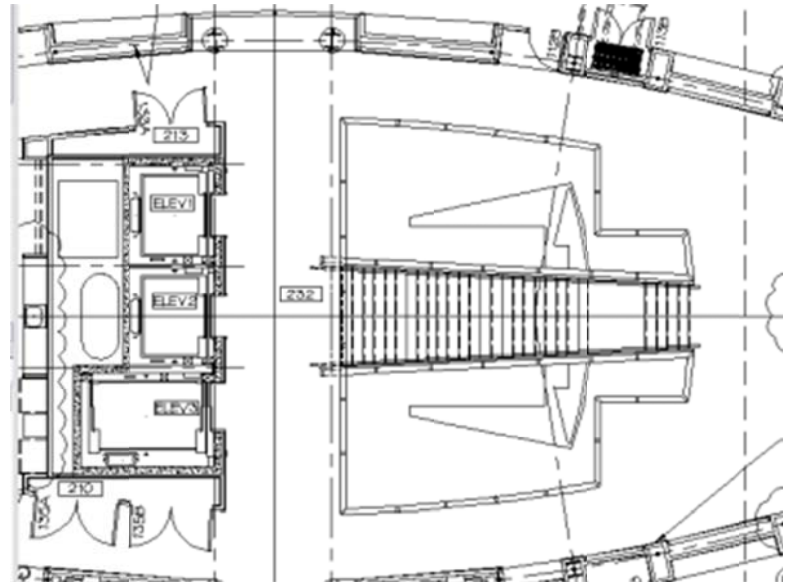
Lobby and Main Stair Case Second Floor Plan#
